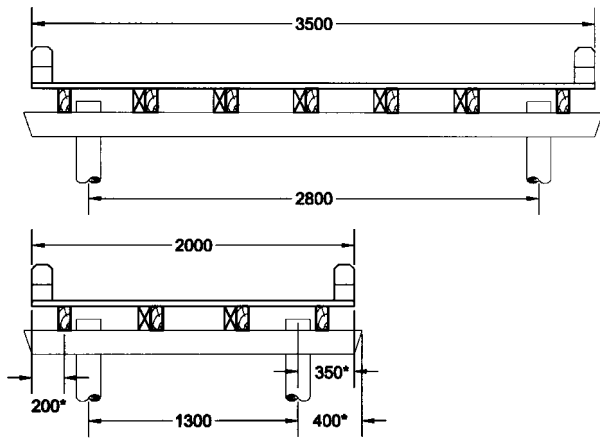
Typical Framing Layout for Golf Car Boardwalks
